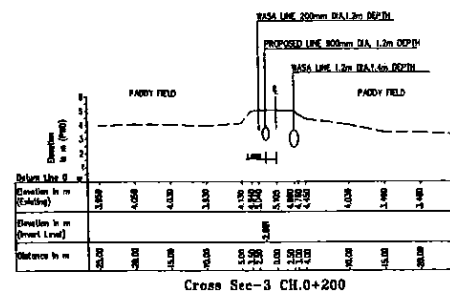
Proposed Transmission Pipeline Cross Section
